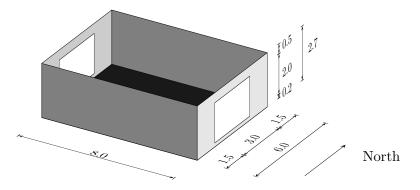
Isometric view of building with west and east windows. The roof is not shown.
